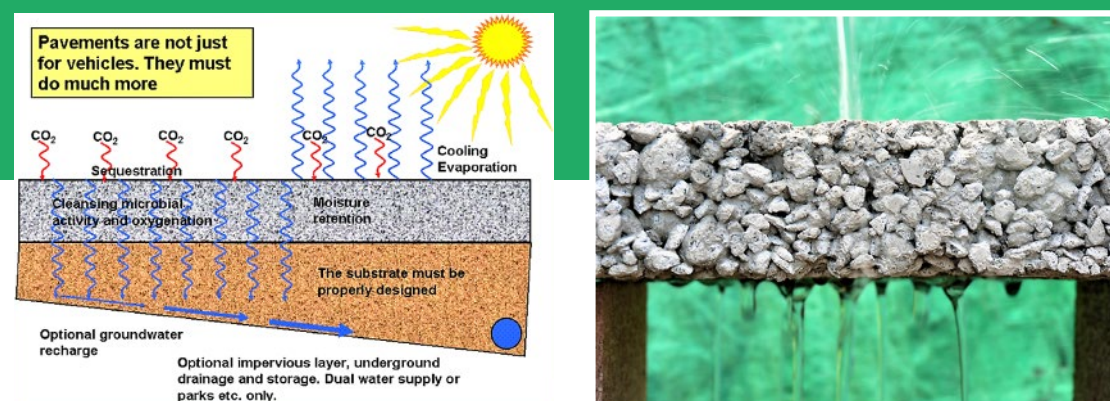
Theoretical and actual cross section of pervious pavement¹⁵
